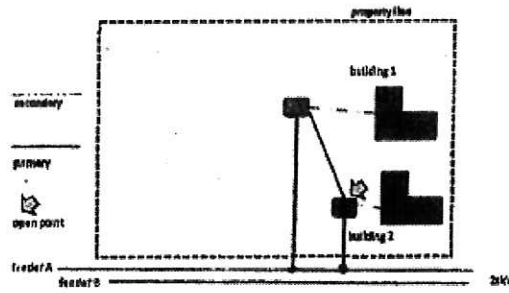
2 BUILDING CONNECTION greater than 1,000kVA
